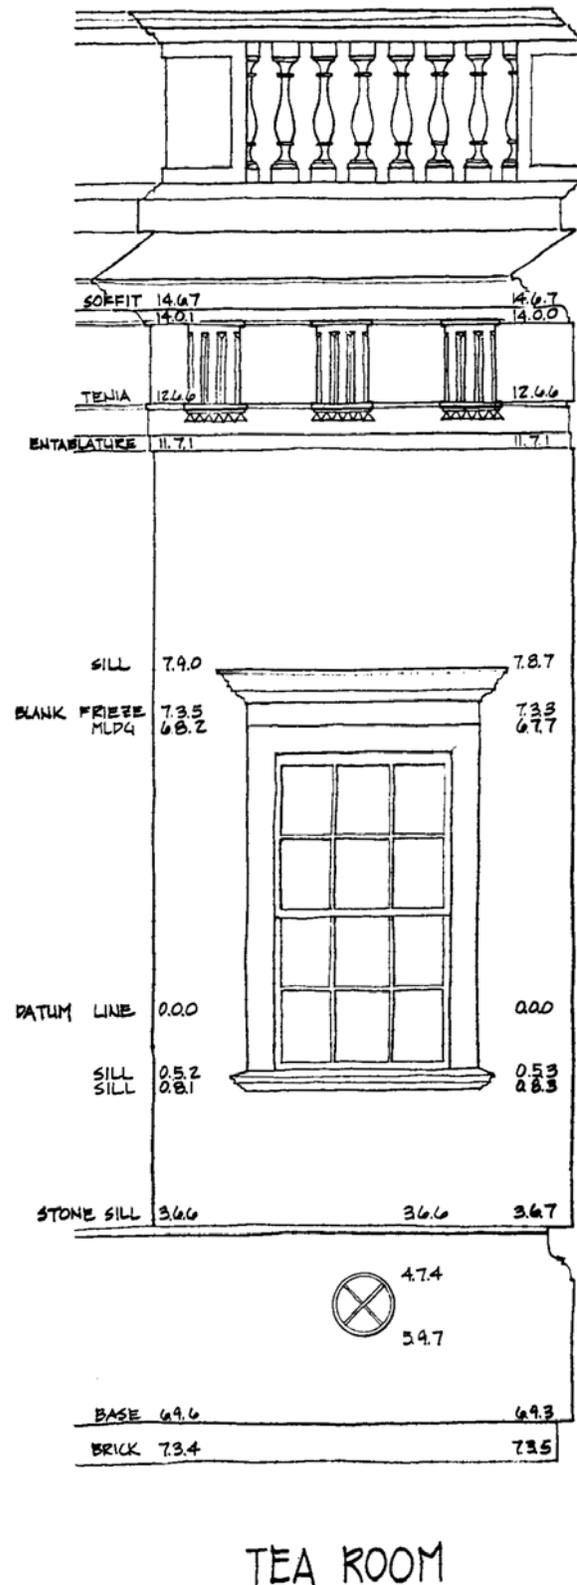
Field sketch of the Tea Room elevation, Monticello, Charlottesville, Virginia.
